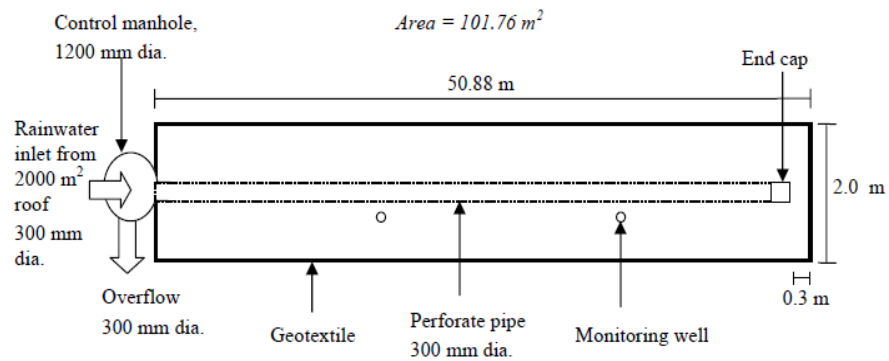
Plan view of the infiltration trench receiving roof runoff only (adopted from Seters et al., 2013).
